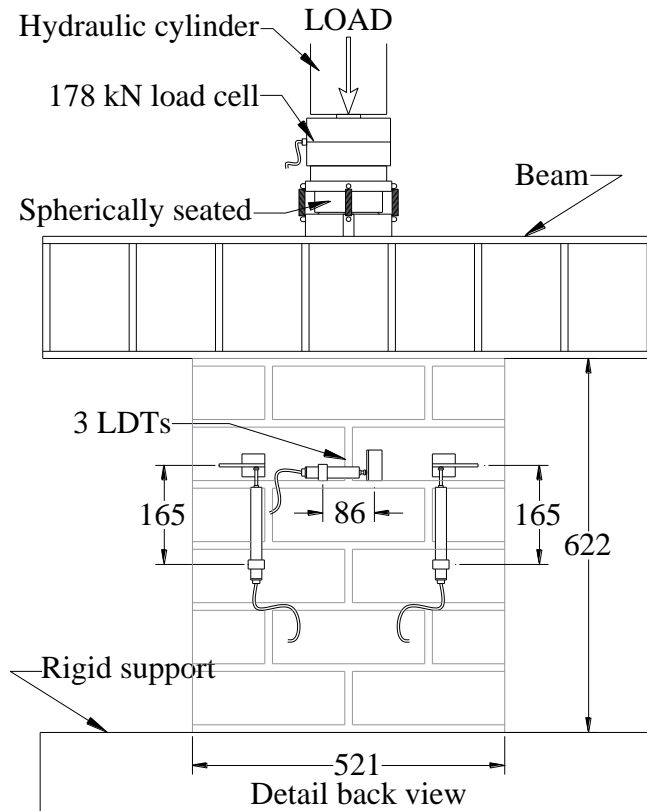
Test setup for compression test on earthen masonry wallettes, back face. Dimensions in mm.
